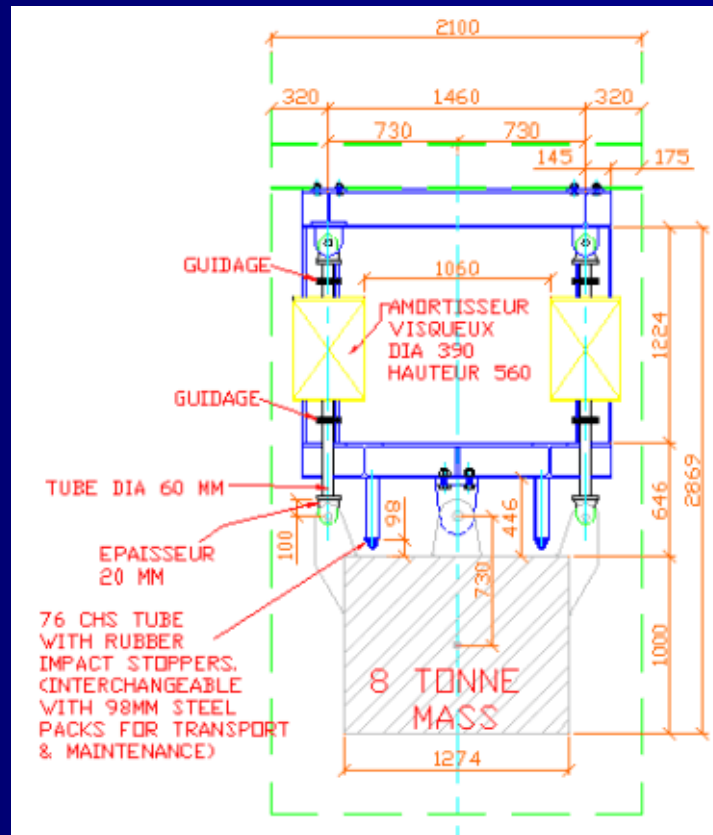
detail principle of damper to be installed in a bridge pylon.
